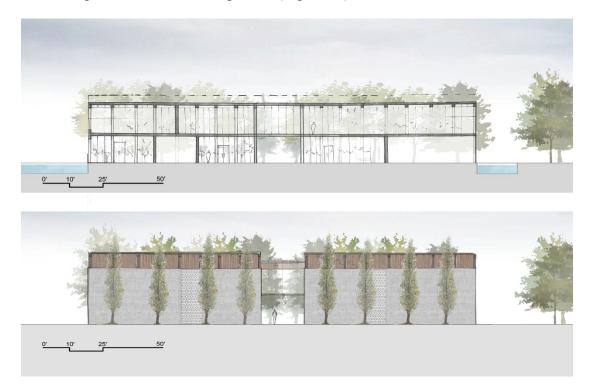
Recreation Center - Longitudinal Section and Front Elevation (Source: Author)
